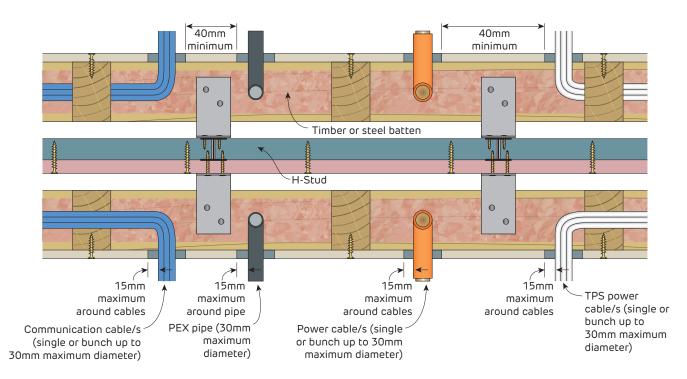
Plumbing and Electrical Penetrations in Wall Linings
